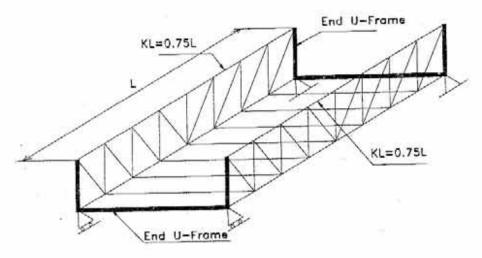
Truss with the Compression Chord Laterally Unbraced
